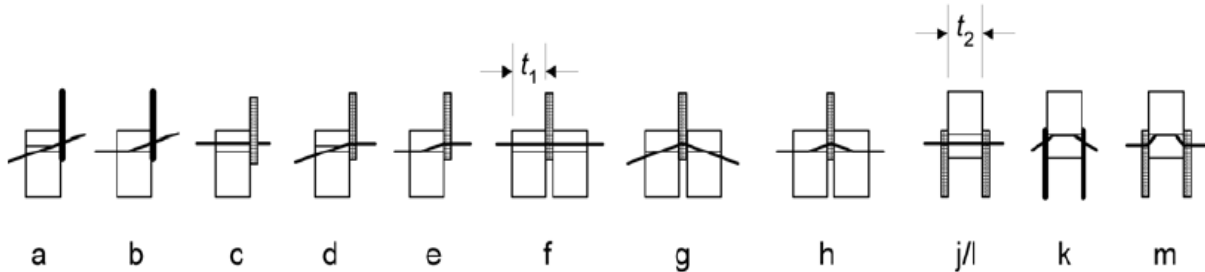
Failure modes (a) to (m) for a fastener in a steel-to-timber connection [2].
